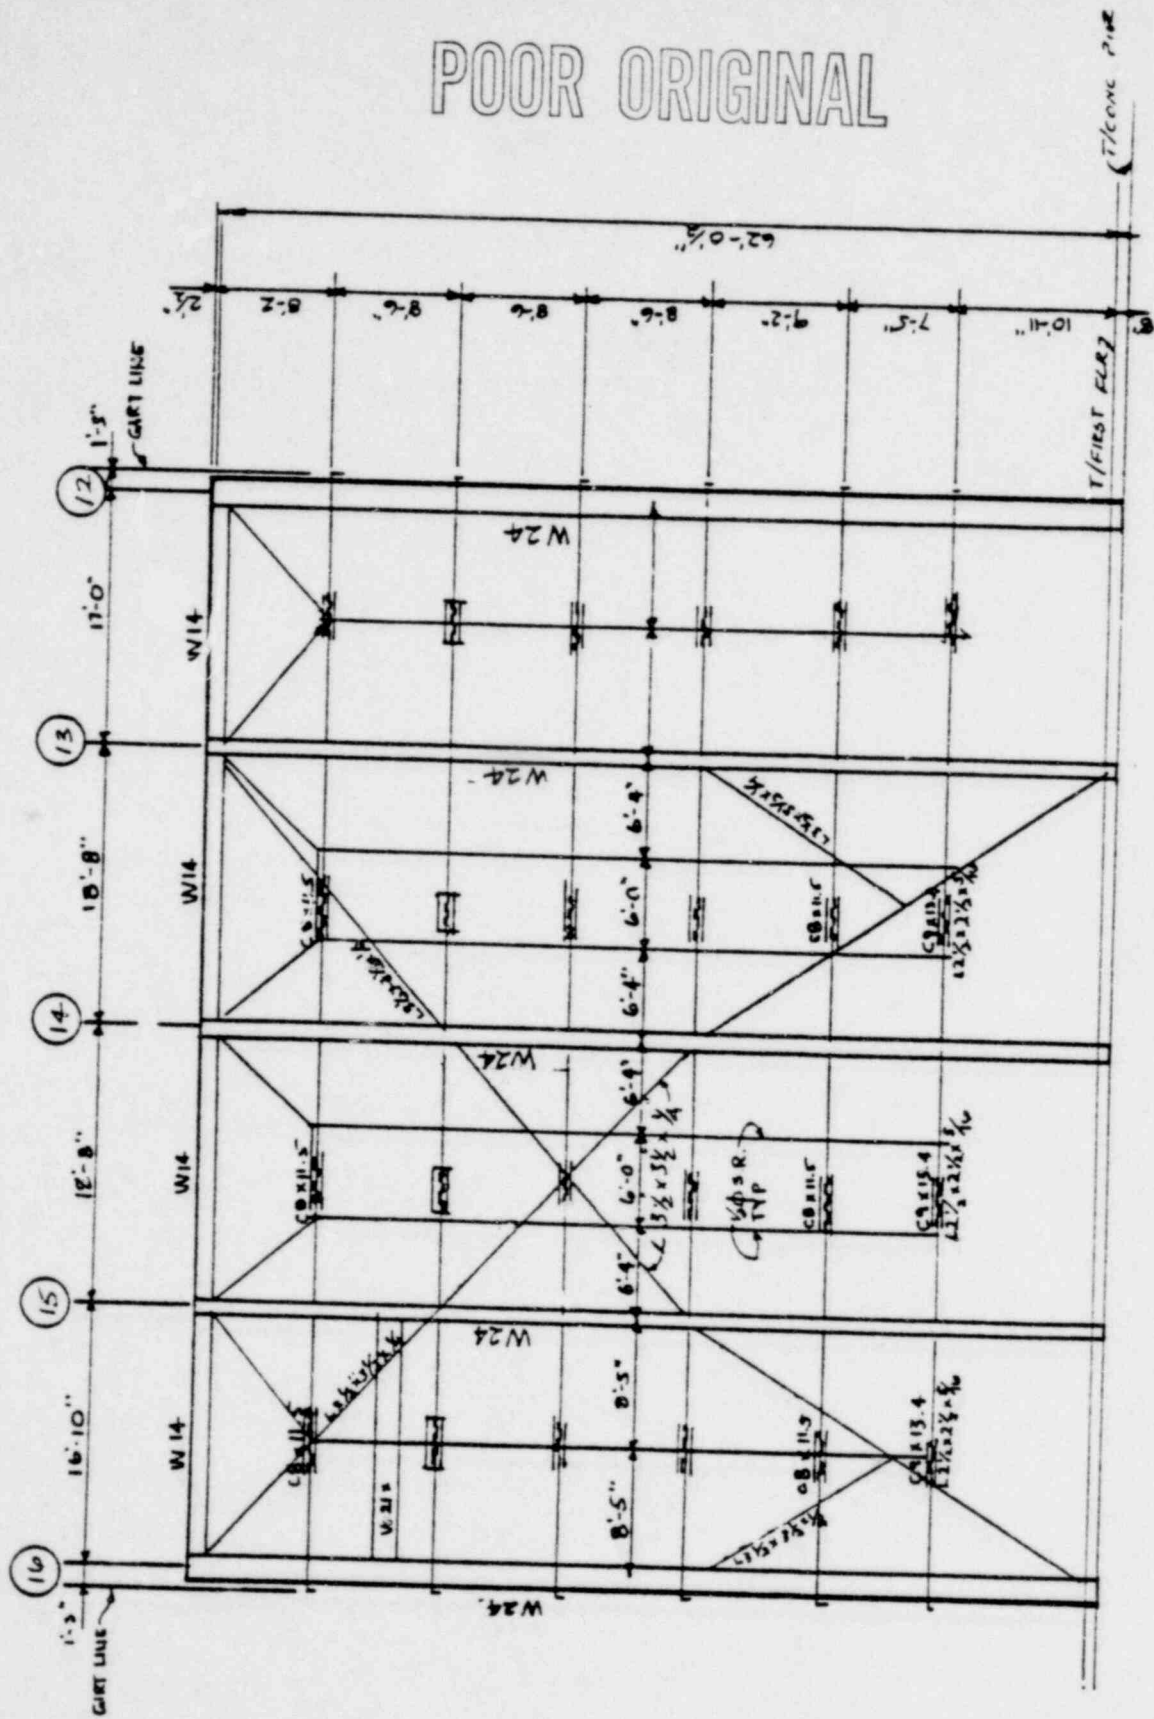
JN-18 WEST WALL BRACED FRAME
